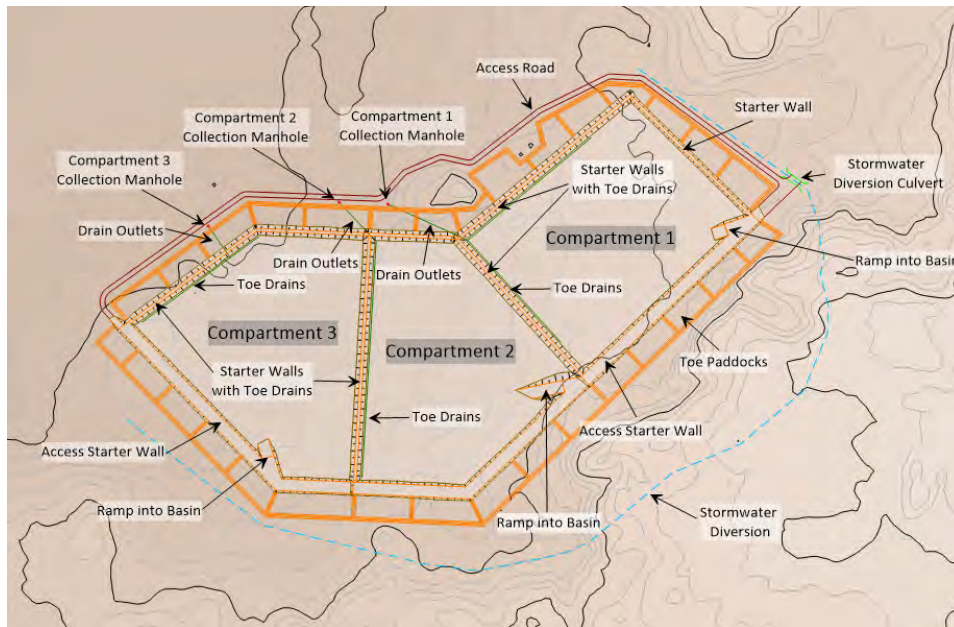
Infrastructure Layout of the Dasa DSTSF.
